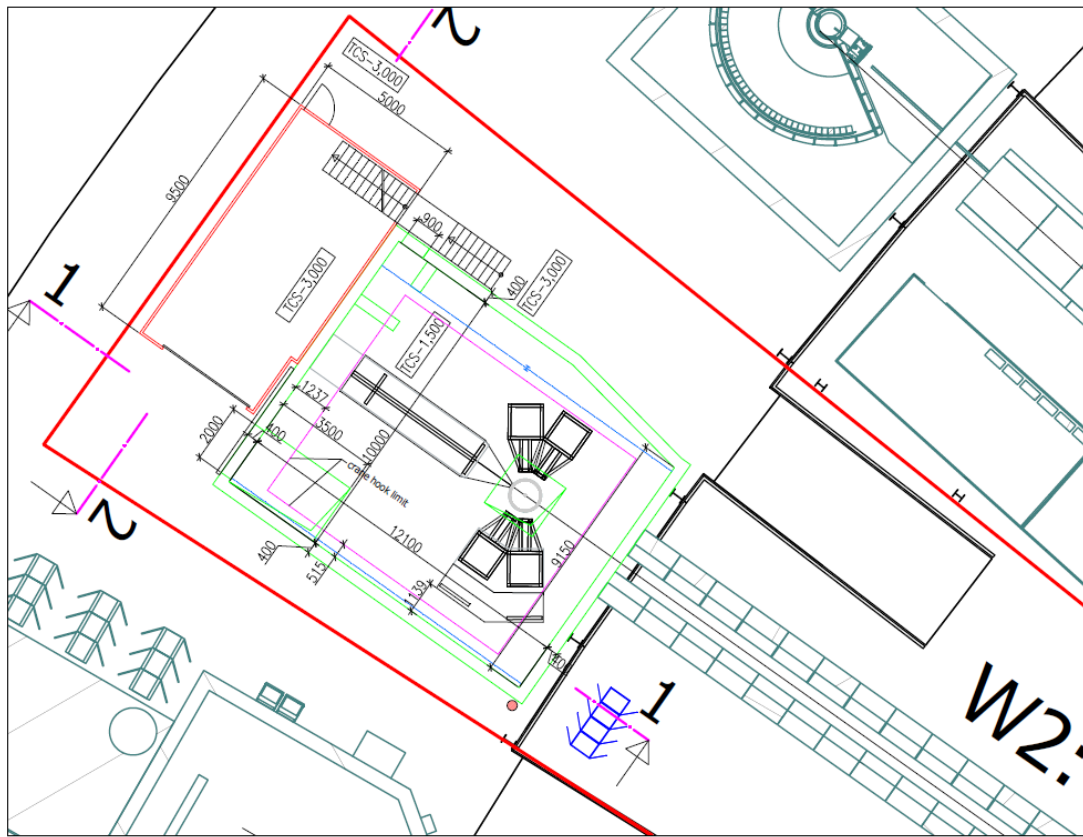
BEER instrument cave layout drawing. Green lines indicate the shielding wall.
